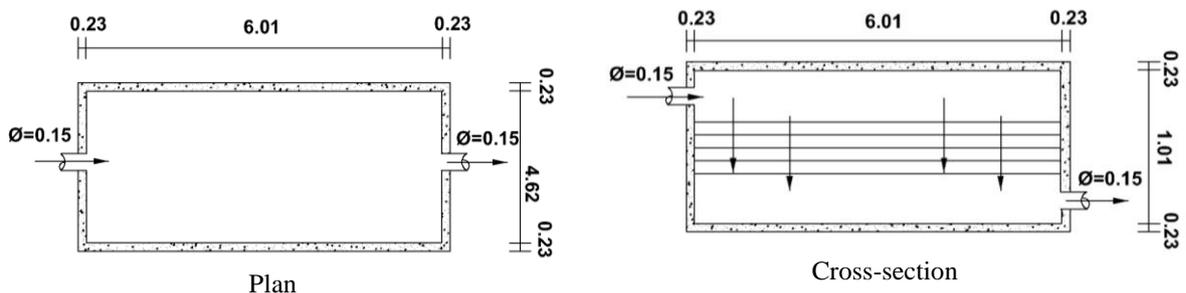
Plan and Cross-section of designed Rapid Gravity Filter (dimensions in m, not up to the scale)
